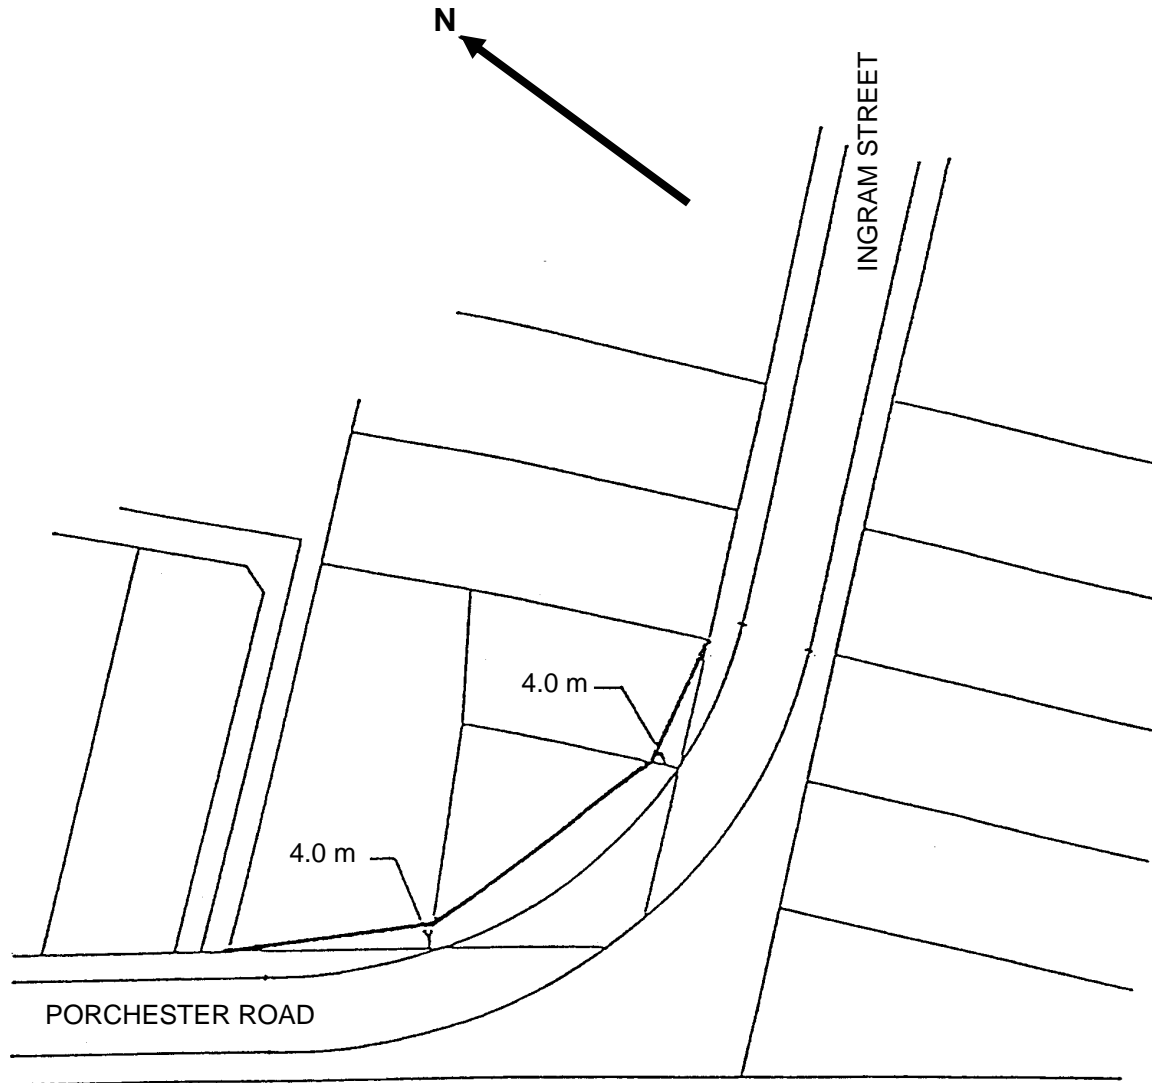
C PROPOSED CORNER EASEMENT – PORCHESTER ROAD/INGRAM STREET
